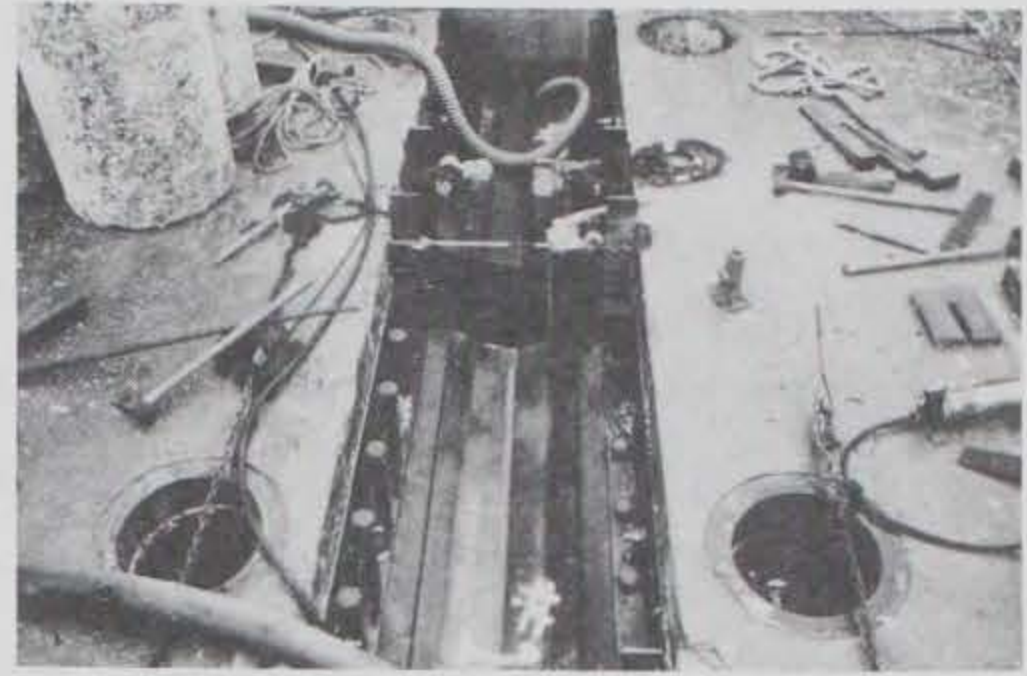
Flexible connectors being bolted to the anchoring plates with 2.5-ft-long, 2-in.-diam bolts.
